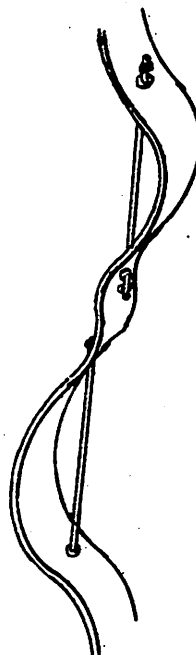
ELEVATION-MOORING DESIGN @ LOW TIDE
